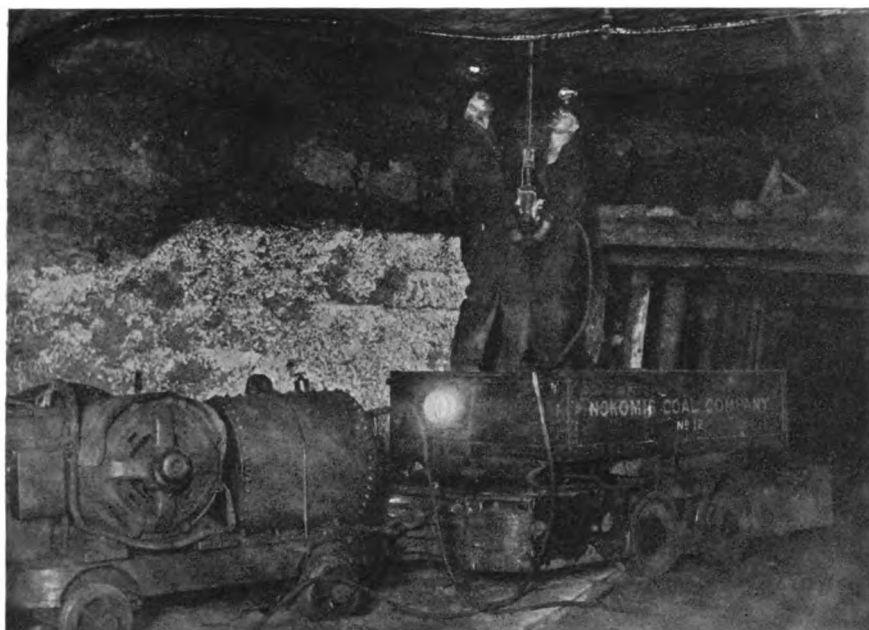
Sullivan WK-2 Portable Compressor, Motor-Driven, operating Sullivan Hammer Drill for boring roof holes; operators are standing on one of the company's 17 storage battery locomotives.
